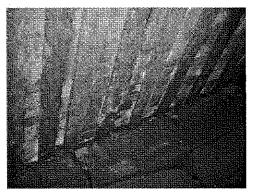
Exposed Reinforcing Bars on Cast in Place Concrete Roof Beams: Inadequate concrete cover appears to be the cause of the initiated corrosion on the bars.
